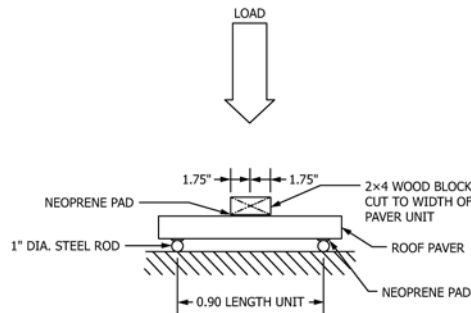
Flexural Strength Test Setup for Concrete Roof Pavers
